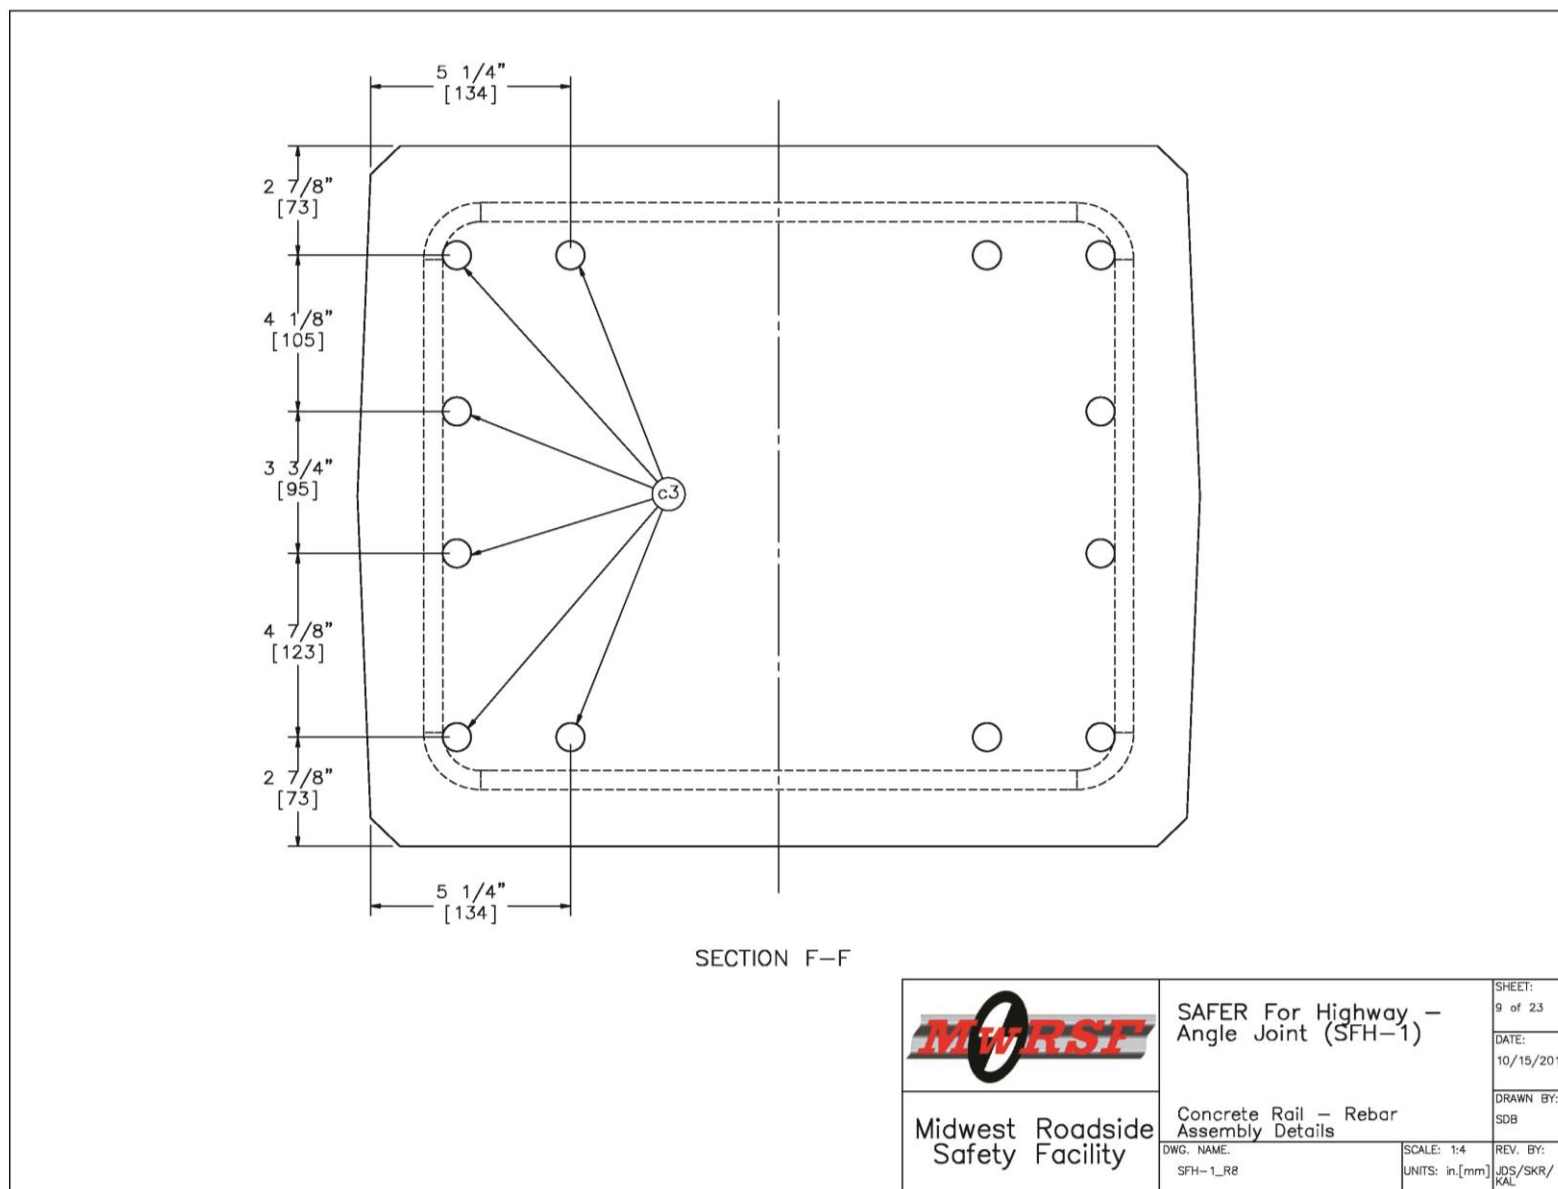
Recommended Barrier Design for Full-Scale Crash Testing, Concrete Rail Details
